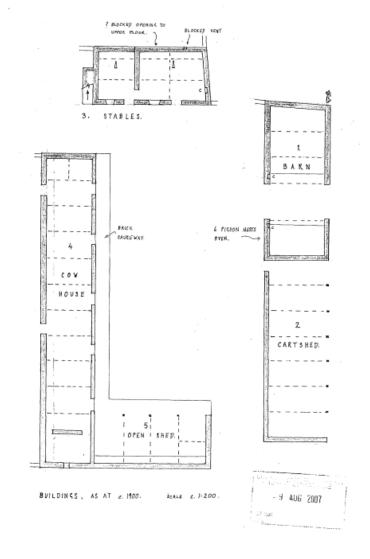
Historic floor plans of buildings c1900 and prior to conversion. Application references 07/02176/LBC
